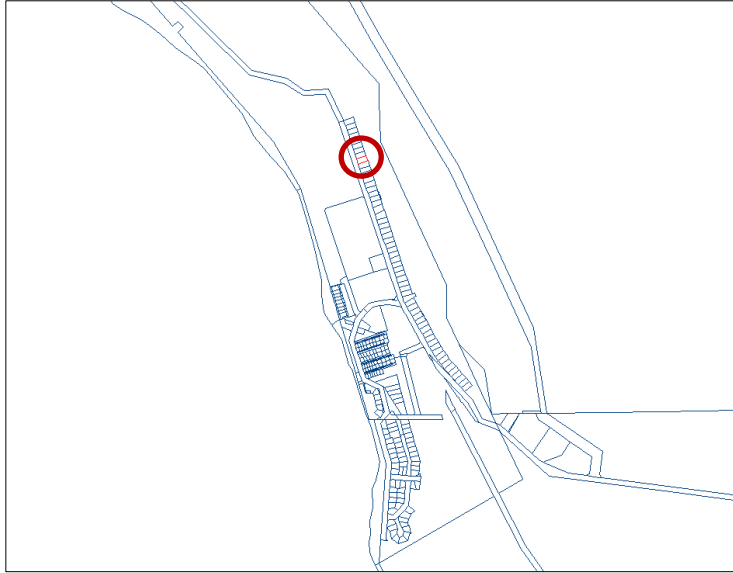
Site plan of Lot 74 (No. 100) Mitchell St, Horrocks
